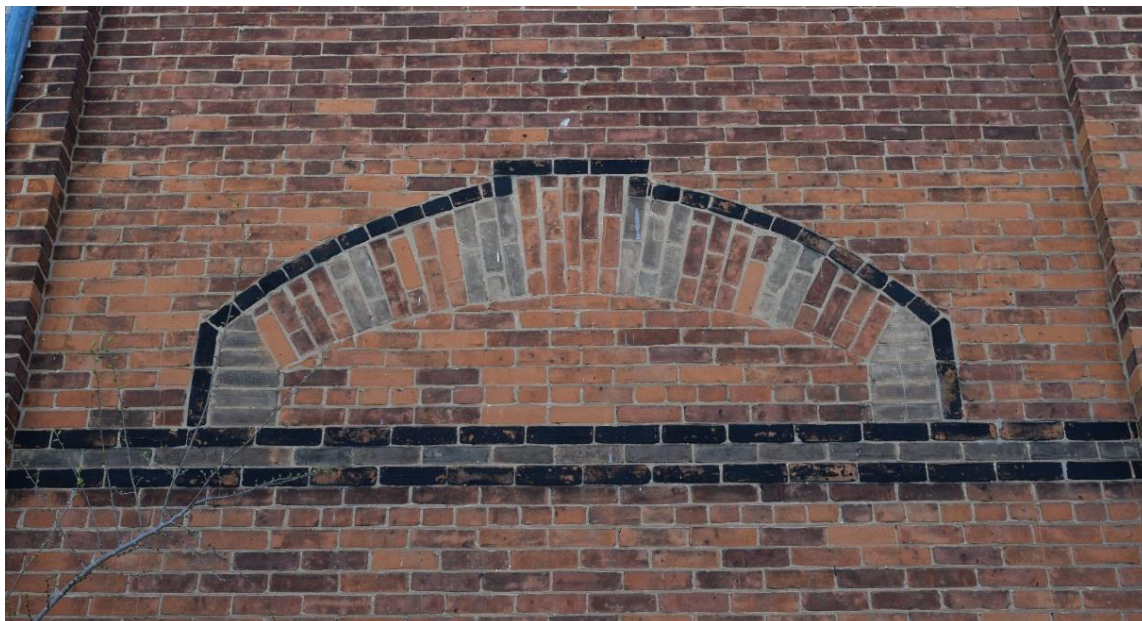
Dichromatic brick belt course and blind window voussoirs on the north wall of the north transept (May 2016).
